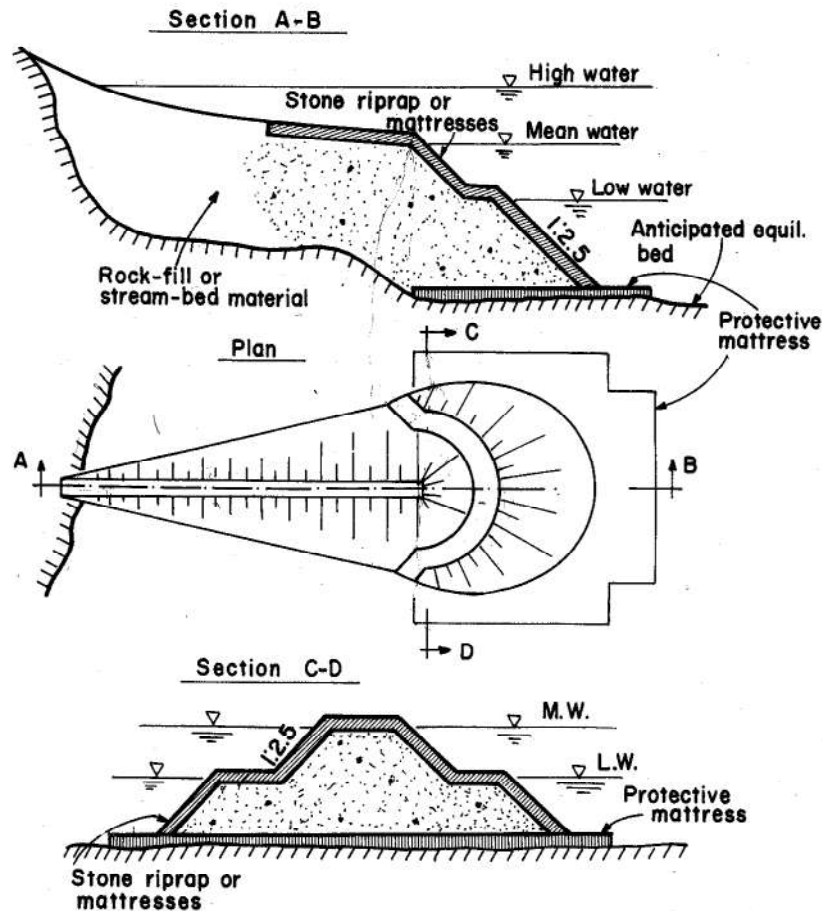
Plan and cross section of a groyne (typical groyne structure)
